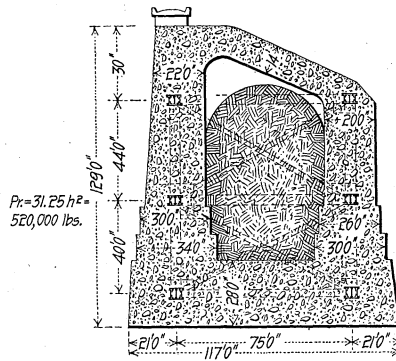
Proposed Design for Hollow Concrete Dam.
